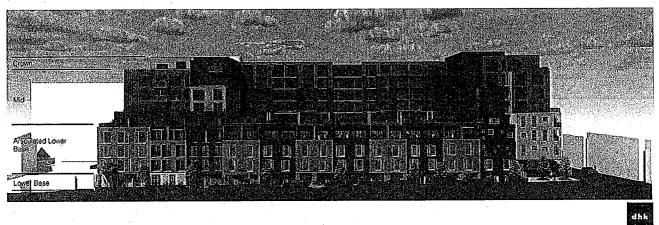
Elevation showing how Building aligns with Tall Buildings Policy
